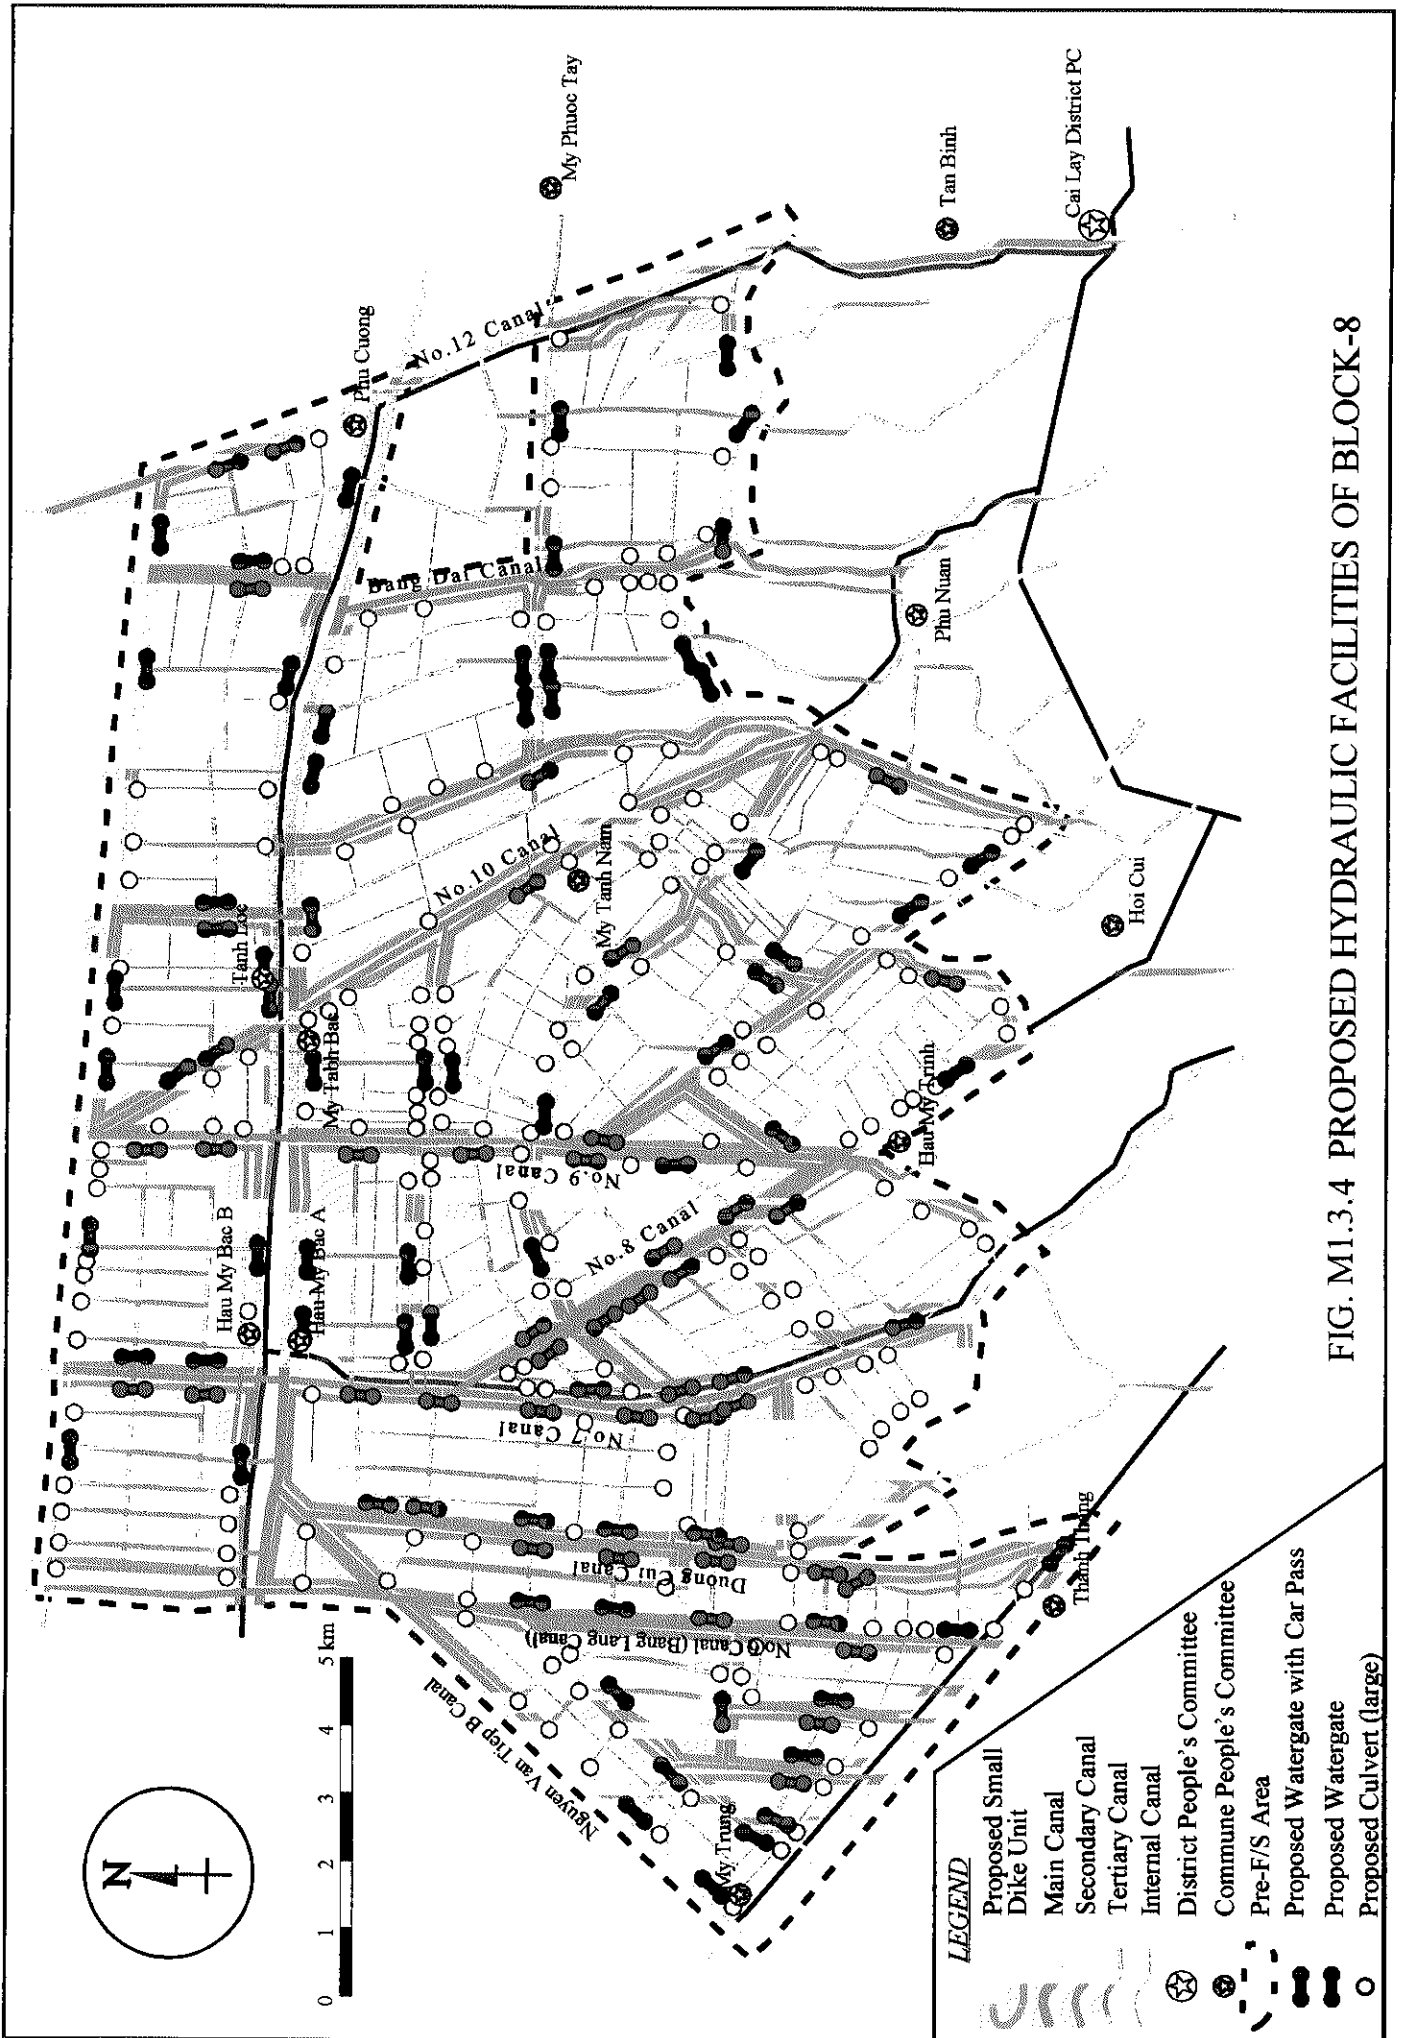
PROPOSED HYDRAULIC FACILITIES OF BLOCK-8
